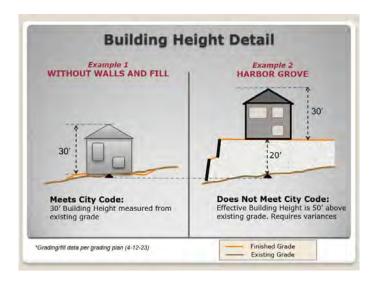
Visualization of elevated building height from fill, from Appellant letter 9-13-23
